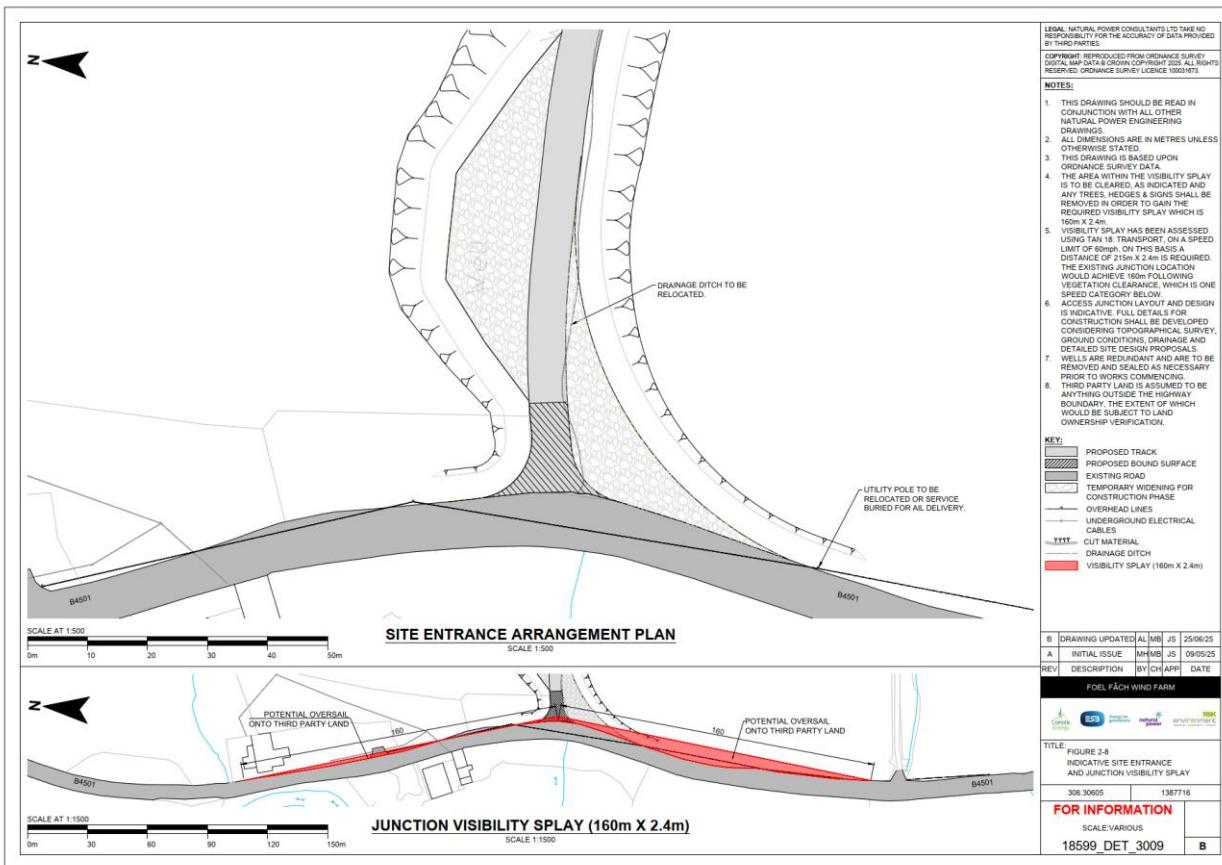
Proposed Site Access – General Arrangement & Visibility Splay
